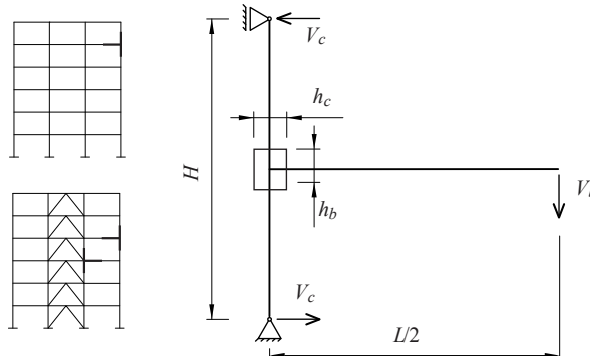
Sample frames with single-sided beam-to-column joint configuration
